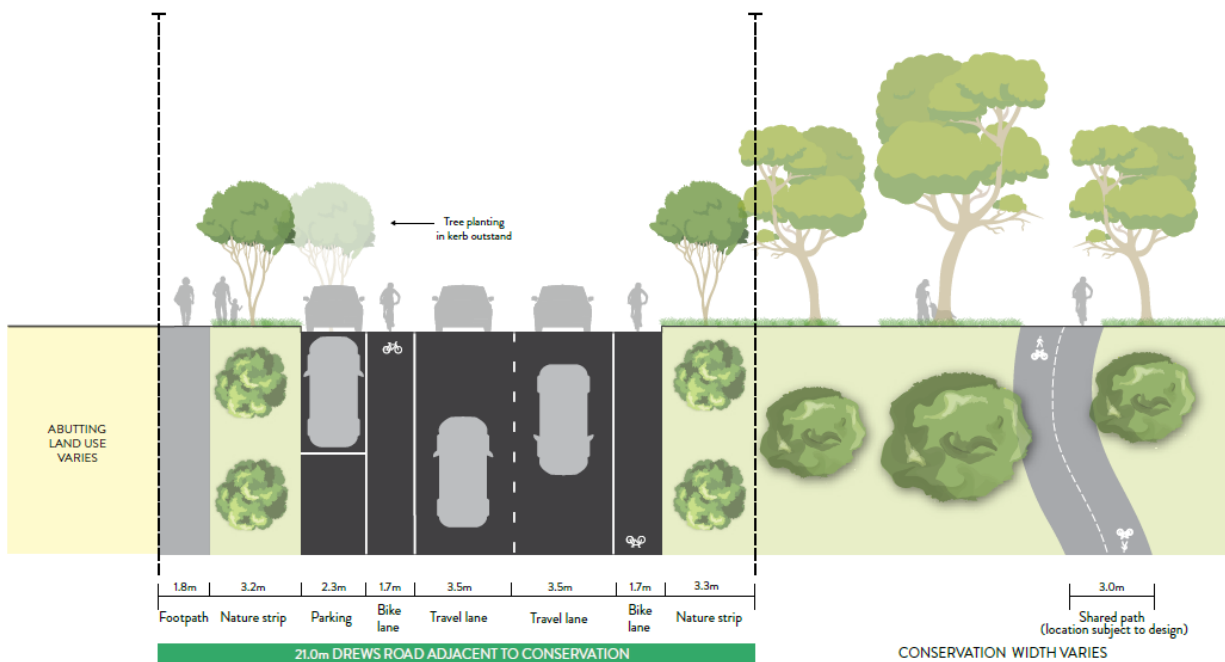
Cross Section C - 21m Dreads Road (Conservation) (Draft Marshall PSP)
